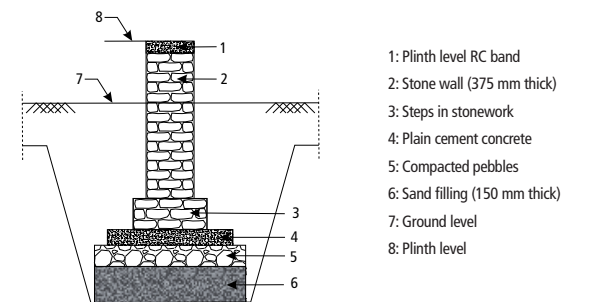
Open foundation stone wall footing (Arya et al., 2014, p. 104)
